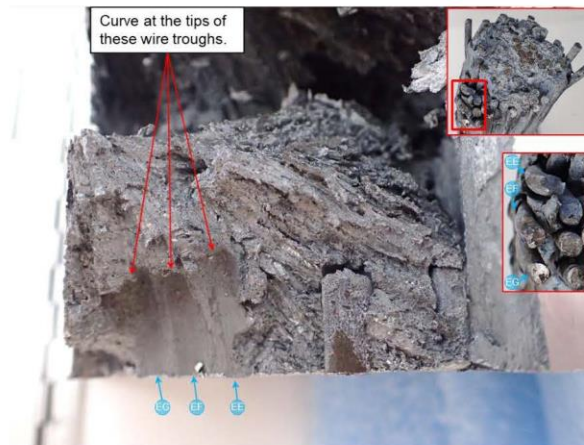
The center lower piece of the socket cavity (the piece closest to the socket base, with one side of the faceted surface feature located on the casting cap side of the piece) has wire channels that bend at where the wire ends were positioned at one time. The wires EE, EF, and EG, that filled those channels are seen in the inset images as-received with the cable-end section.
